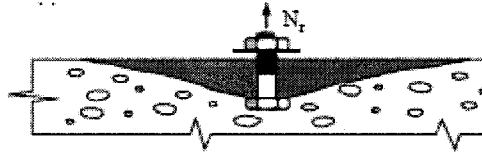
Concrete breakout resistance of anchor in tension (CSA A23.3-04)
